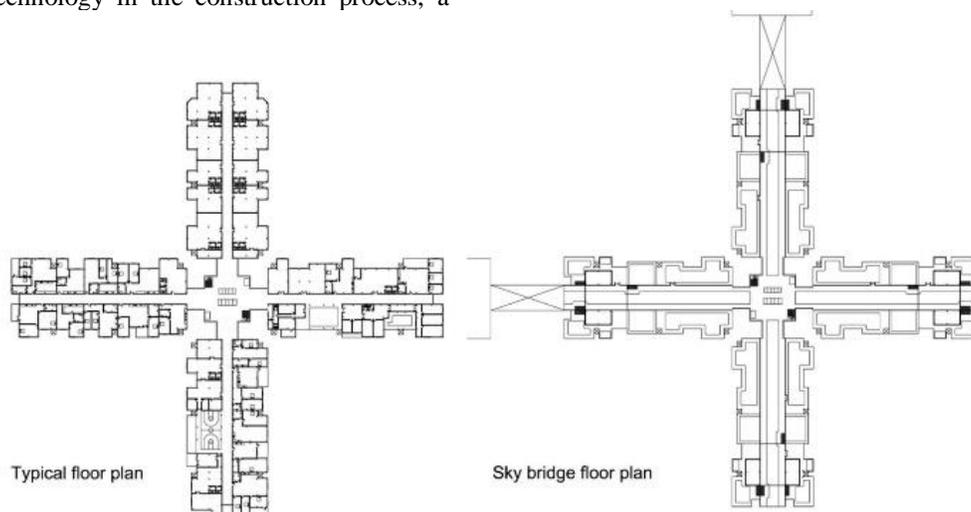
Typical floor plans in the dynamic vertical urbanism complex
